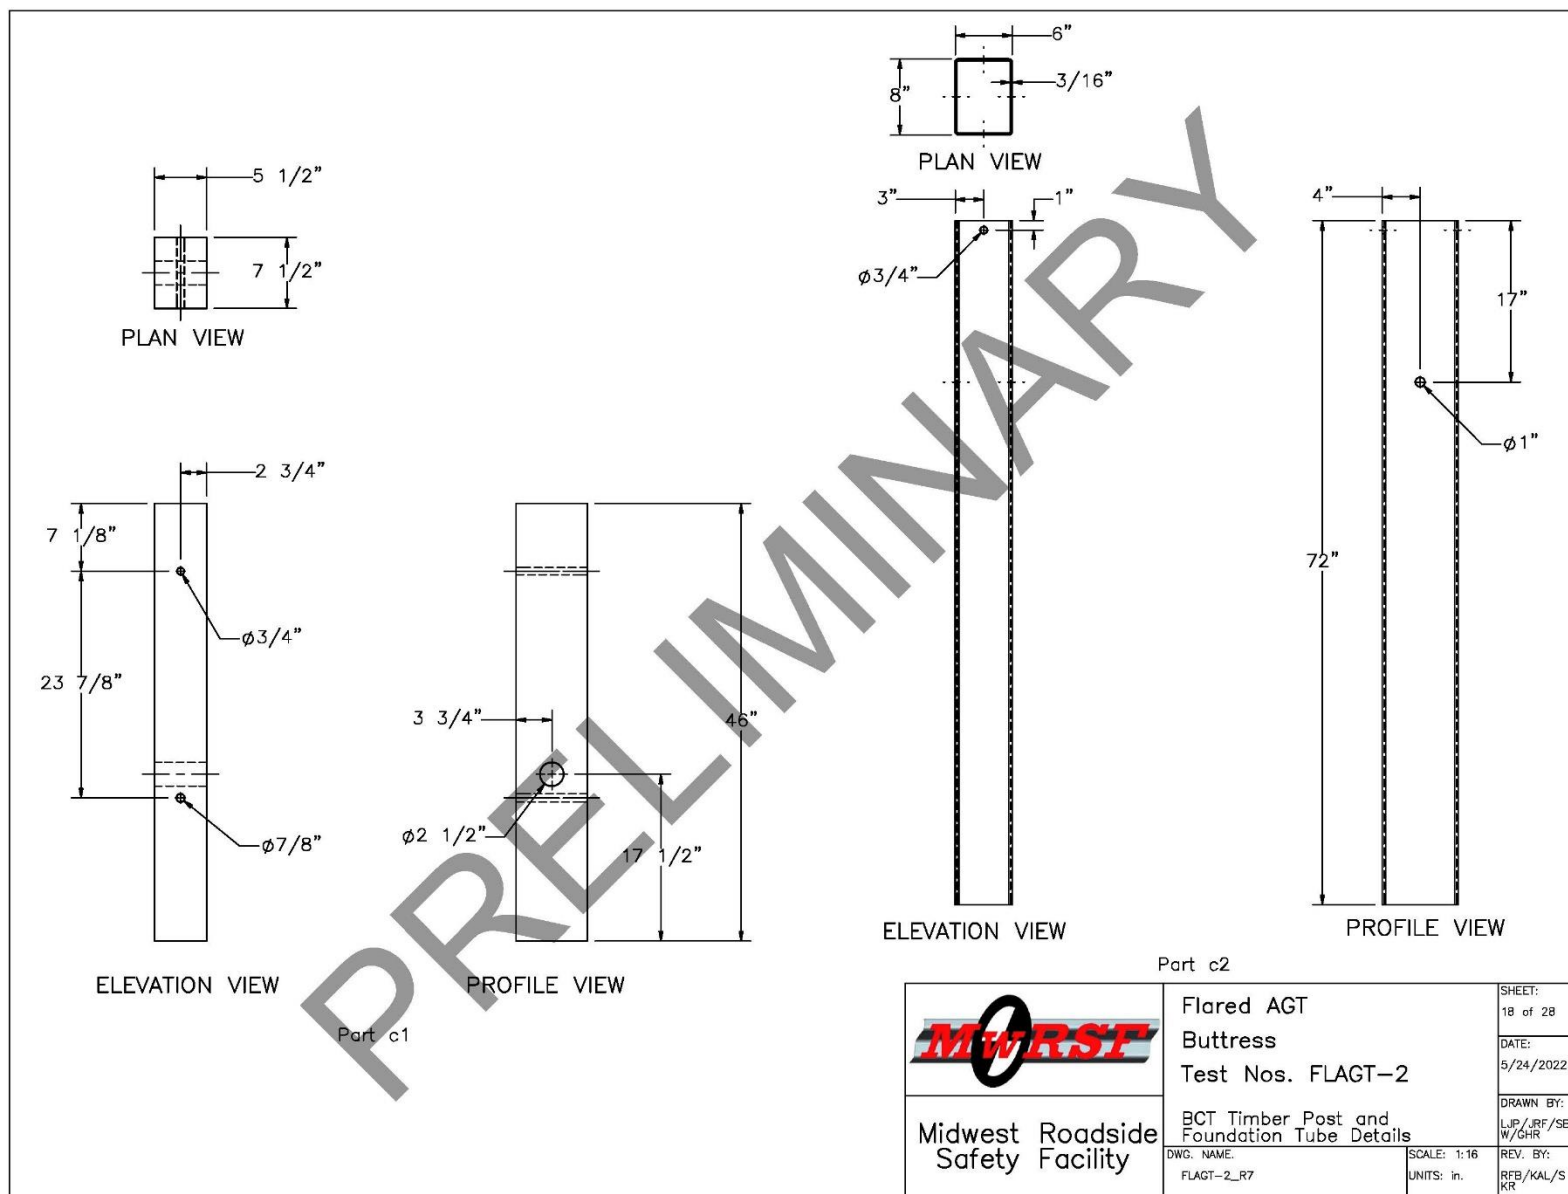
BCT Timber Post and Foundation Tube Details, Test No. FLAGT-2
